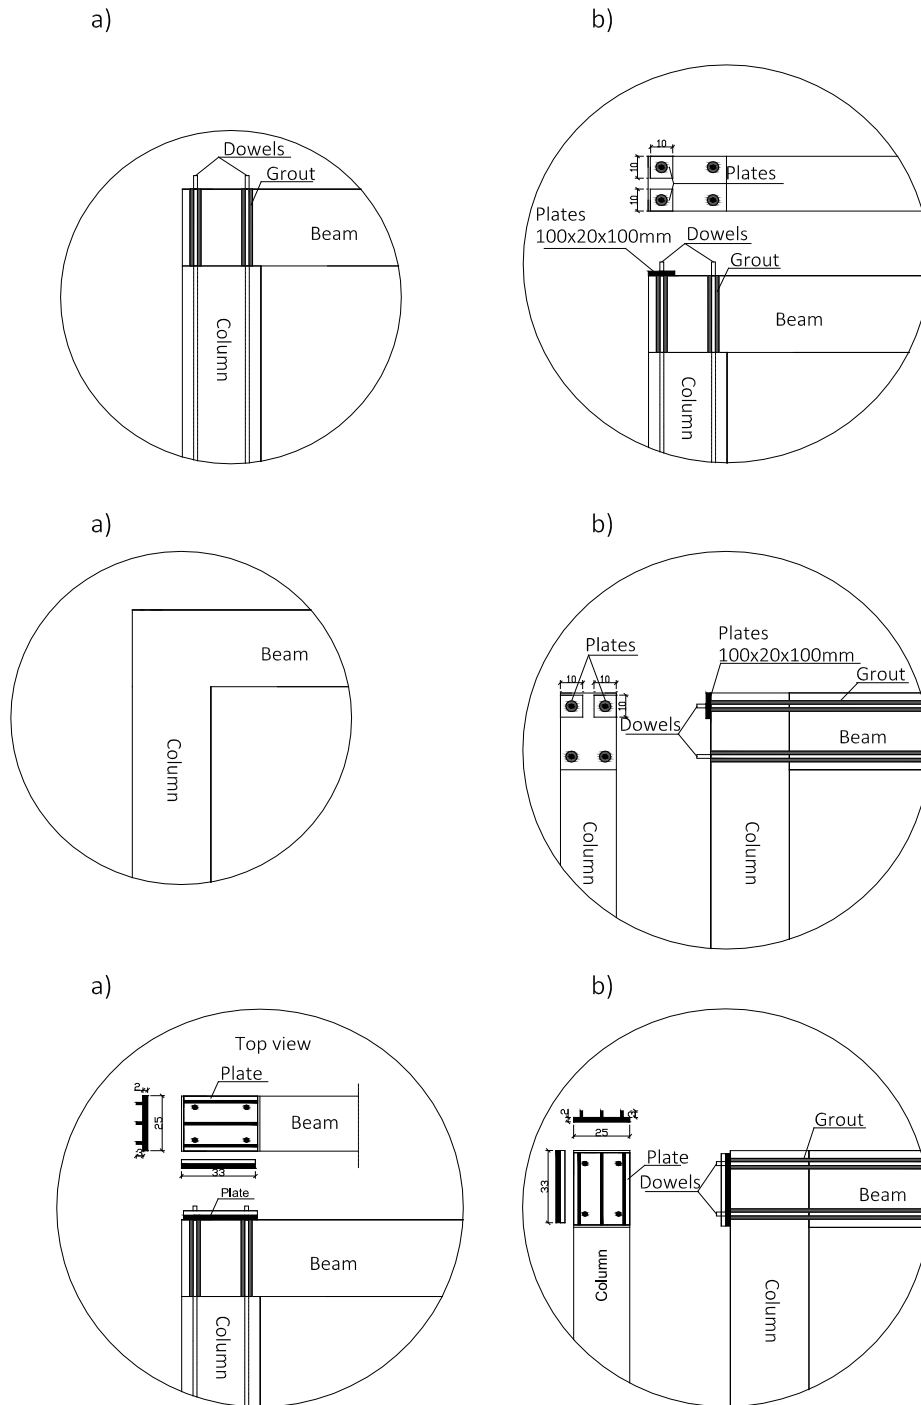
Connection performed with vertically positioned dowels where dowels are anchored with grout only (a), connection performed with vertically positioned dowels where two dowels in tension are strengthened with individual plates (b), cast-in-situ connection (c), connection performed with horizontally positioned dowels where two dowels in tension are strengthened with individual plates (d), connection performed with vertically positioned dowels where all dowels are strengthened with one large plate (e), connection performed with horizontally positioned dowels where all dowels are strengthened with one large plate (f).
